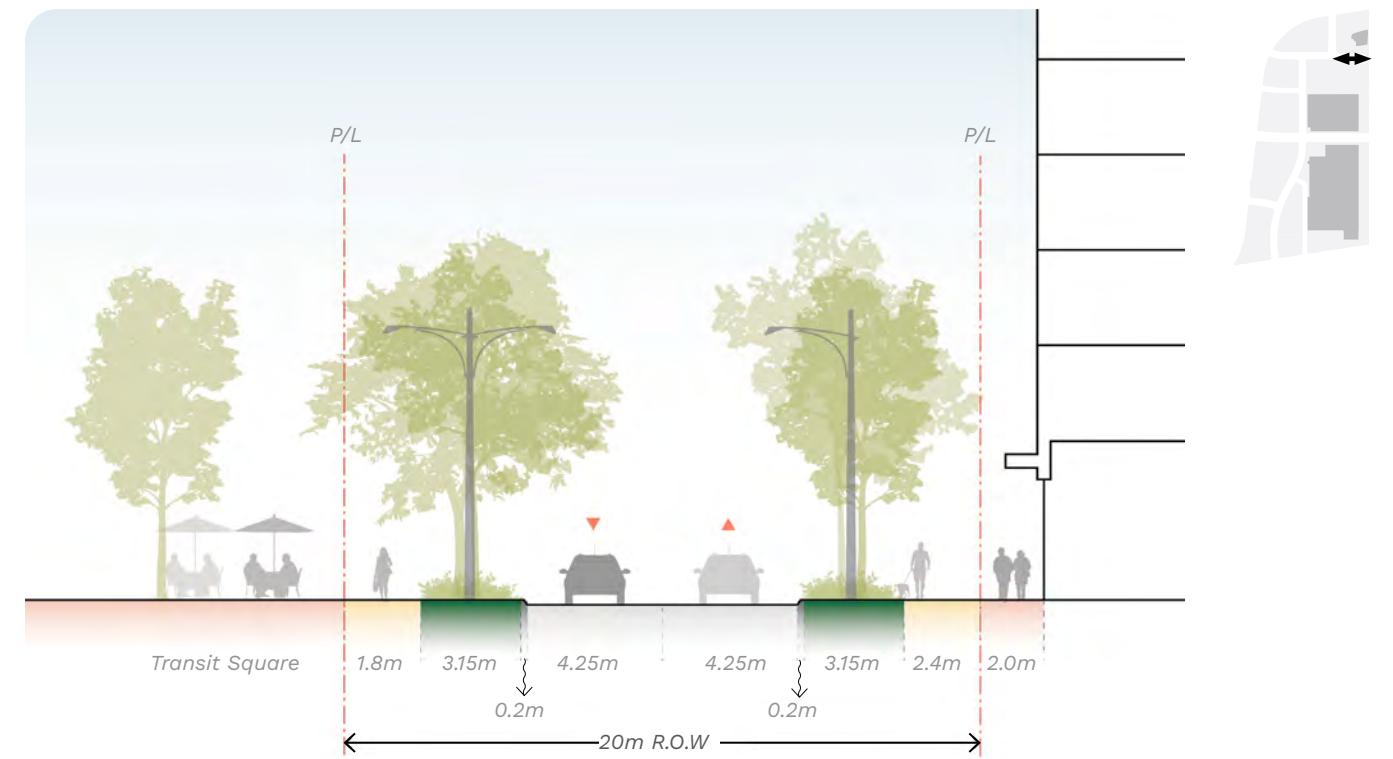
Conceptual Tuscan Gate Extension, East of Vitti Street Cross Section.
